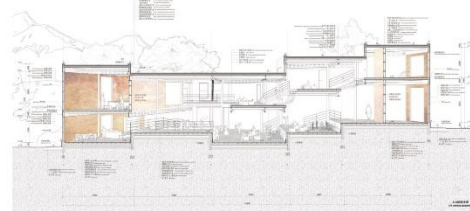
Example of detail construction design course (project: dormitory, source: author)
